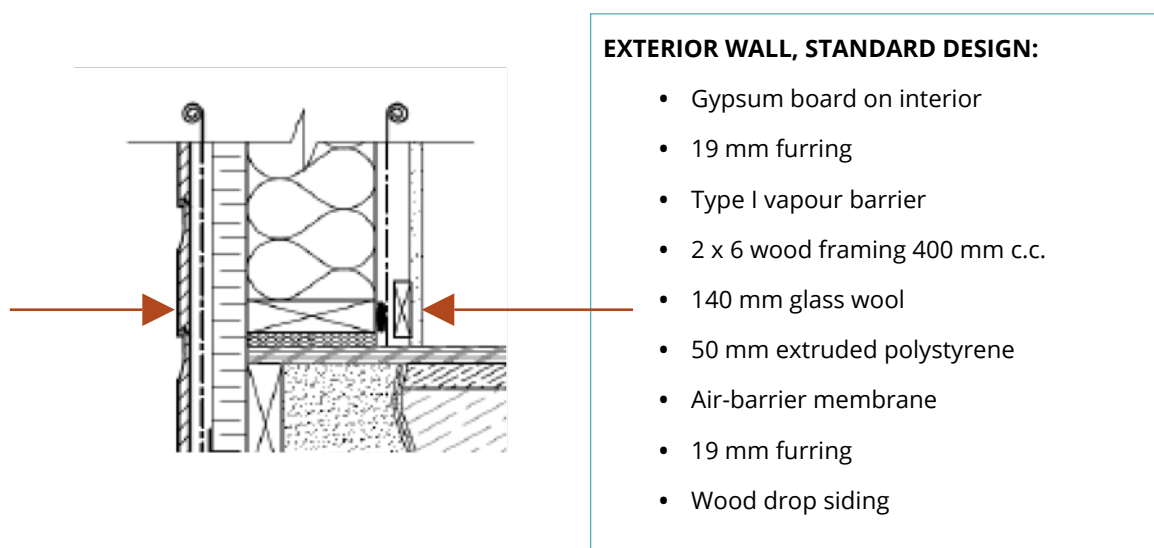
CROSS-SECTION OF STANDARD EXTERIOR WALL / SOURCE: SHQ
